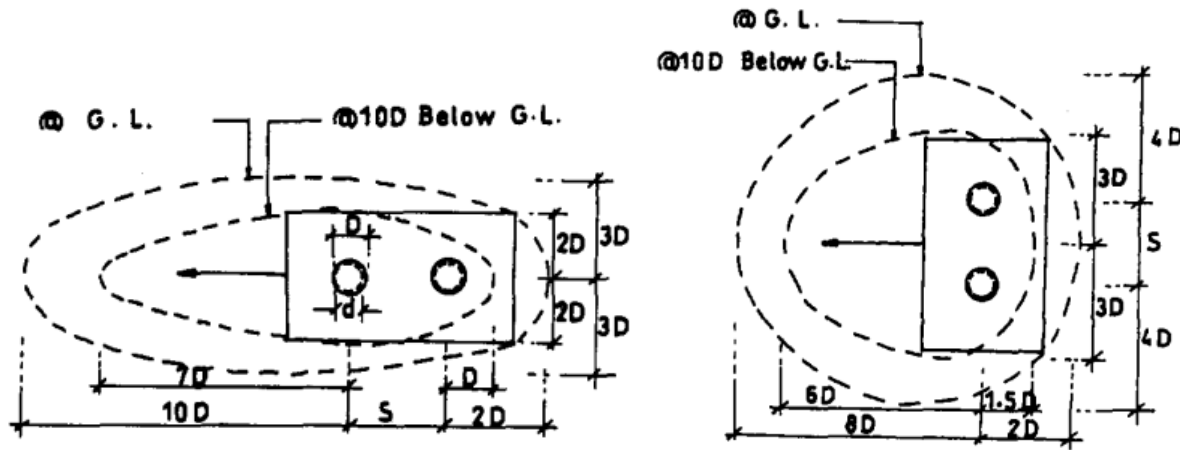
Stress zones around pile groups loaded in-line and transverse to piles arrangement line (Rao et al. 1998b)
